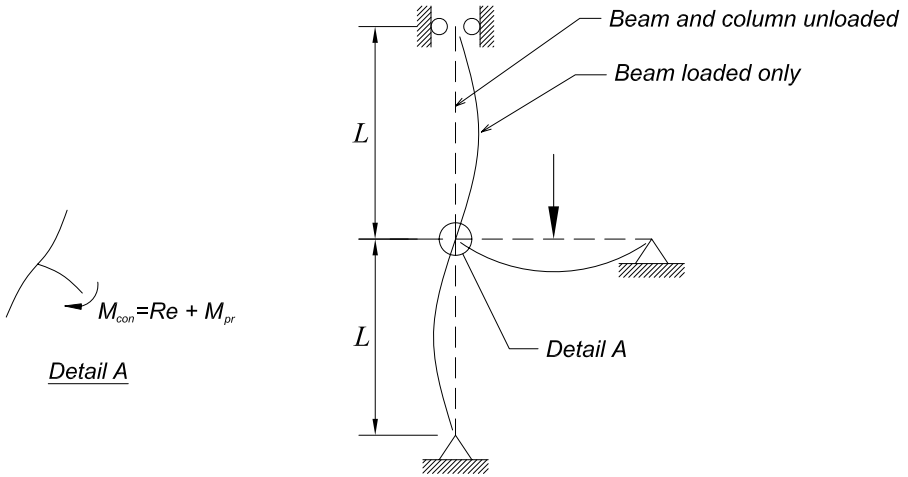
Illustration of beam, column and connection behavior under loading of beam only.
